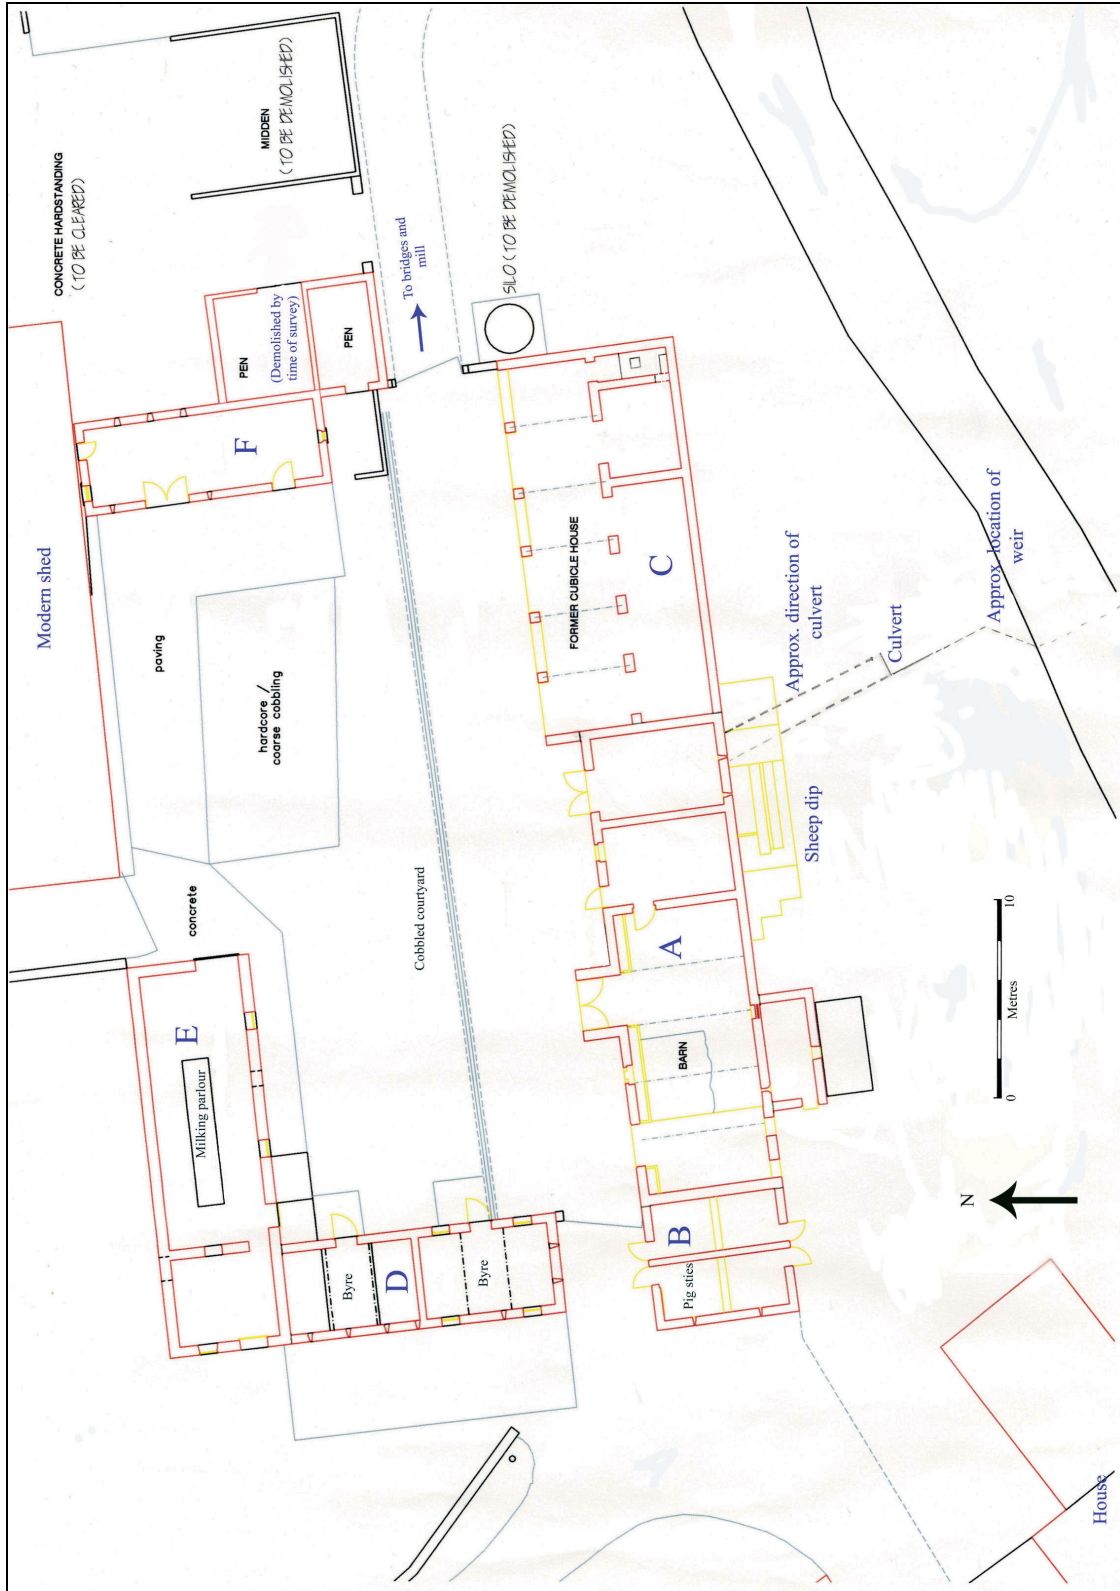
Plan of farm buildings (Data captured at 1:200)
